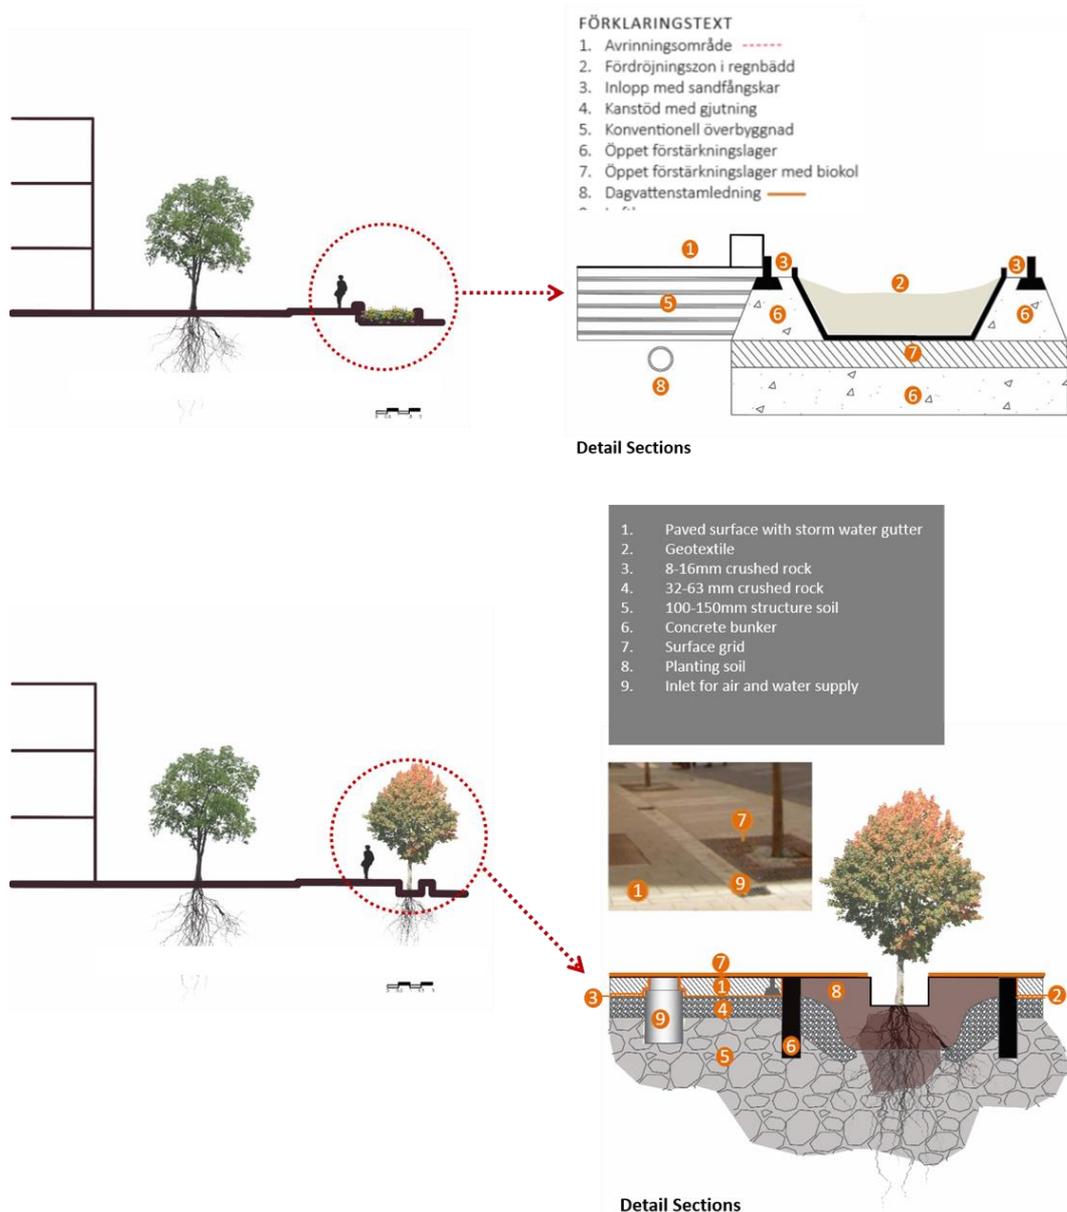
Detail section of rain-beds beside the streets to improve greenery and manage stormwater. The sections and the details are produced by the author.
